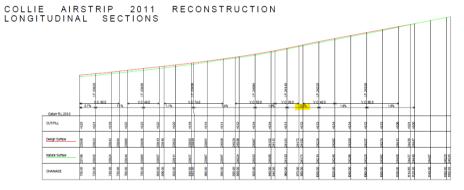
Collie Airfield runway longitudinal section ch 960-1000
